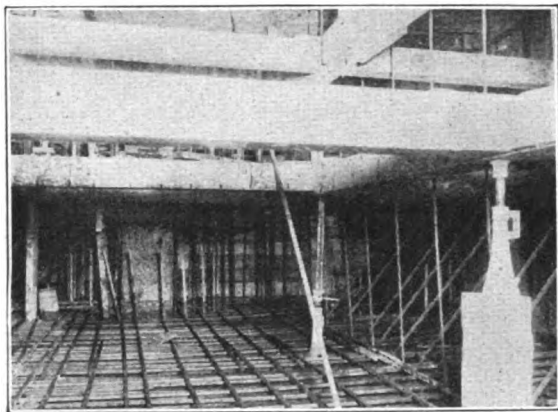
View of Bottom of Tail Pit Taken at the Time Concrete Was Being Poured, Showing Method of Supporting Cofferdam Bracing.
